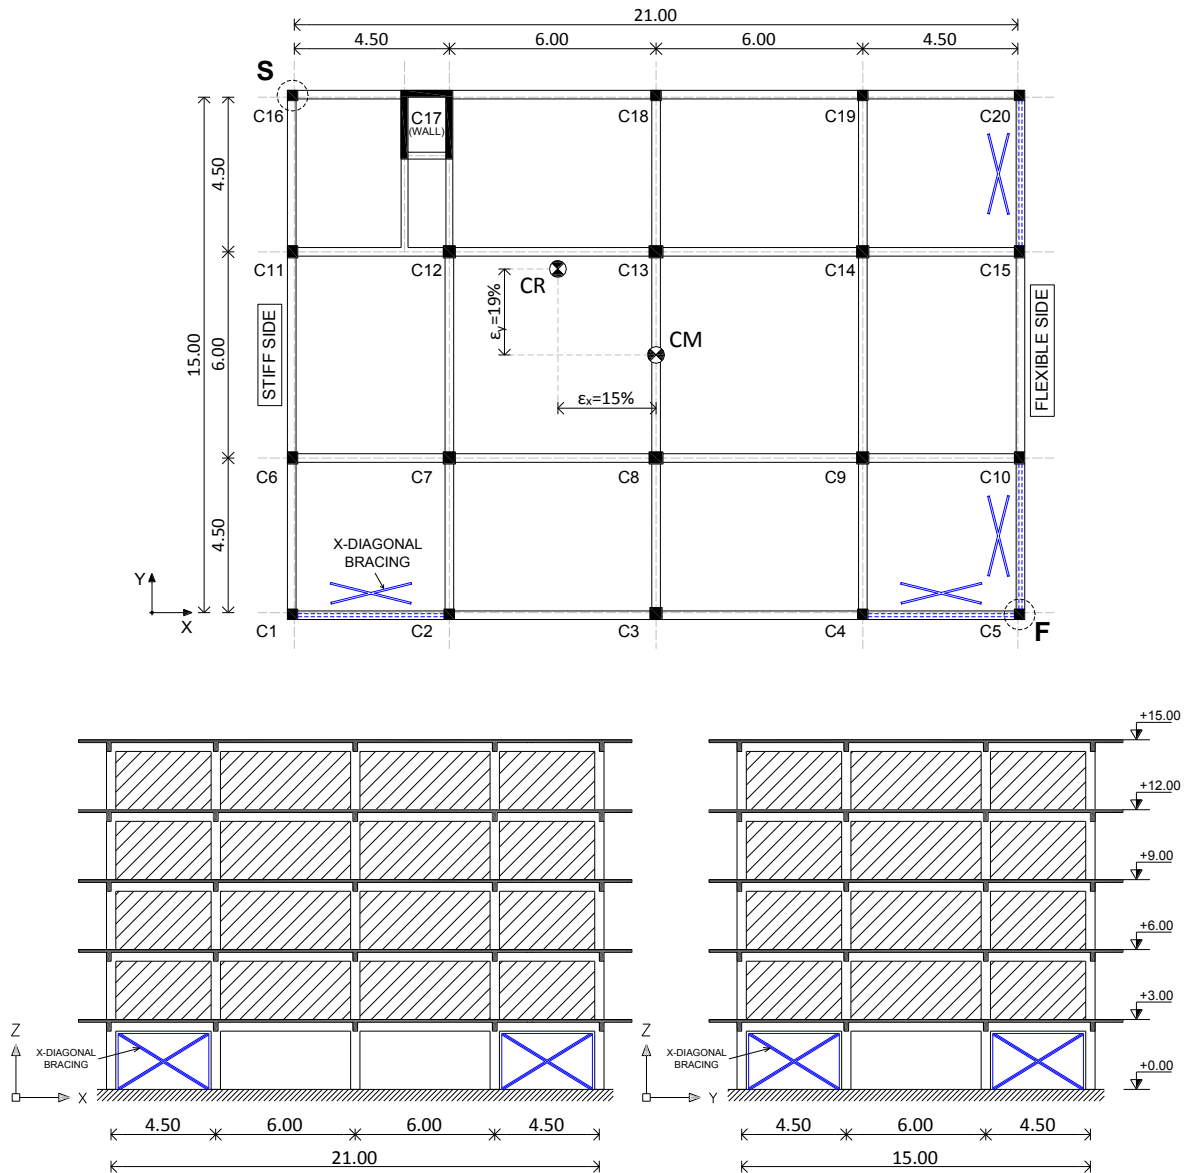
Typical layout of the non-symmetric 3 and 5 story buildings (top) and corresponding elevations along x and y directions of the 5-story building (bottom).
